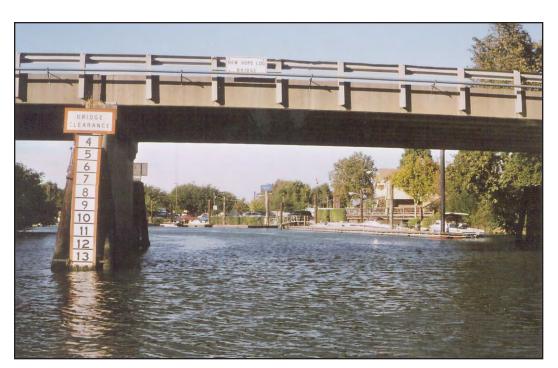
View of New Hope Bridge from the South Fork of the Mokelumne River, looking north. Note Wimpy's/New Hope Marina complex visible beyond bridge. This bridge would be subject to retrofit or replacement under Alternatives 2-A through 2-C.
